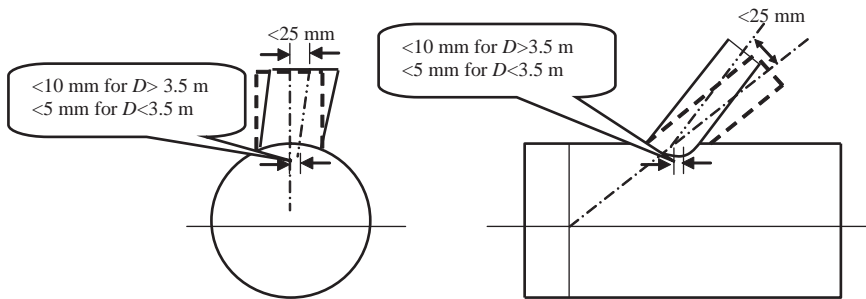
Allowable tolerance for tubular joints by ISO.
